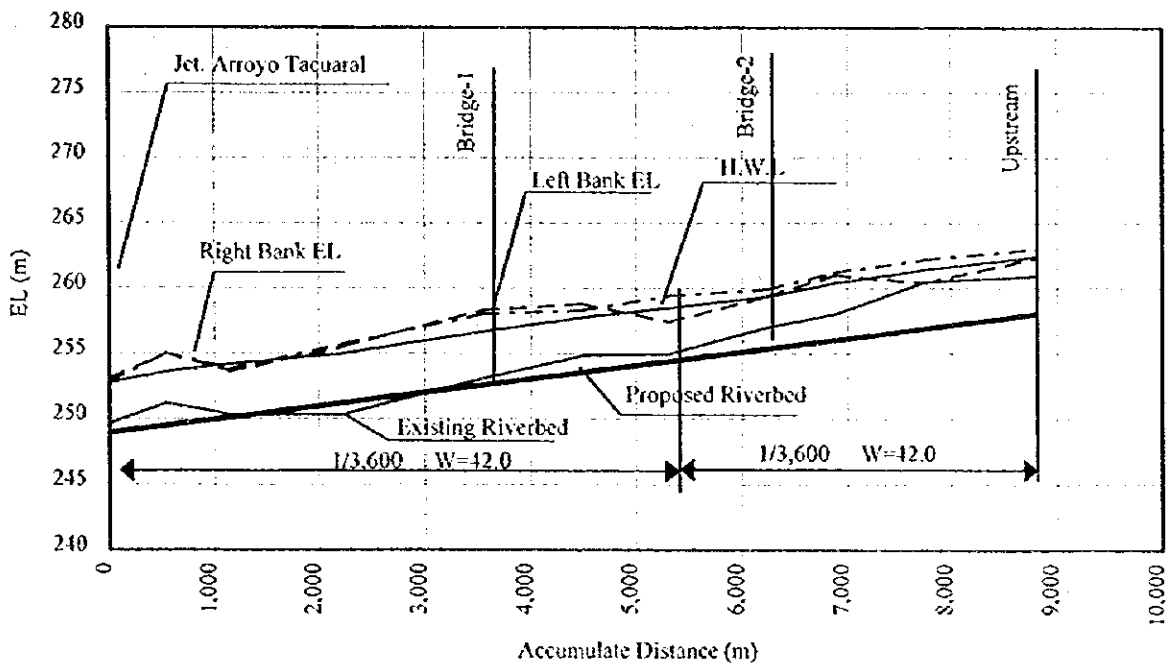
(4) LONGITUDINAL PROFILE OF DRAINAGE IMPROVEMENT
